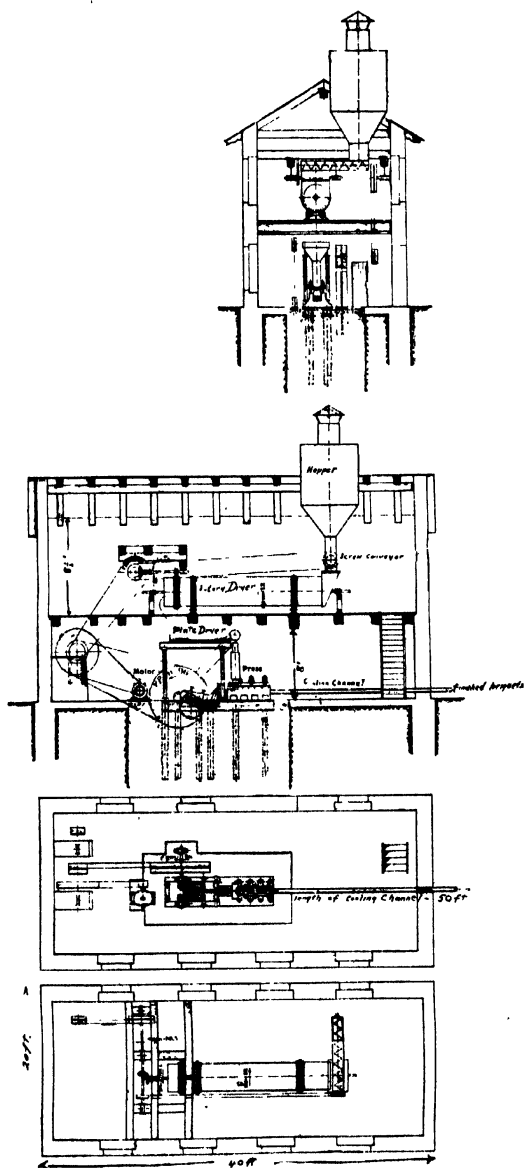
Layout of Typical Wood Waste Briquette Plant. Arnold System.
